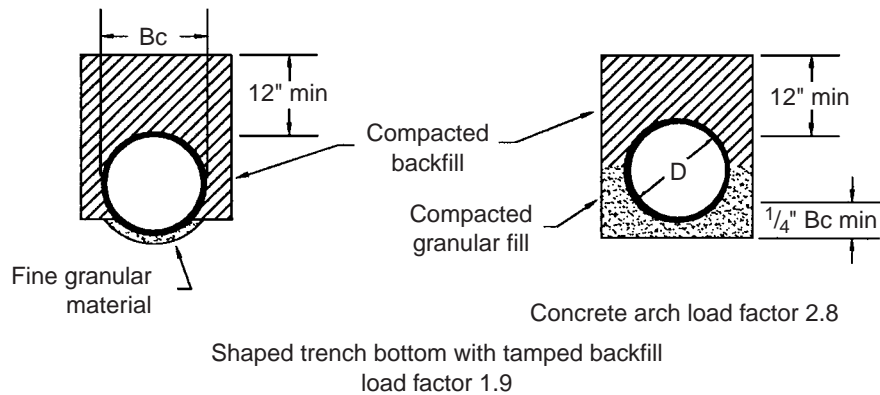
Class B pipe bedding detail. (American Society of Civil Engineers, *Design and Construction of Sanitary and Storm Sewers*, 1969. Used with permission of ASCE.)
